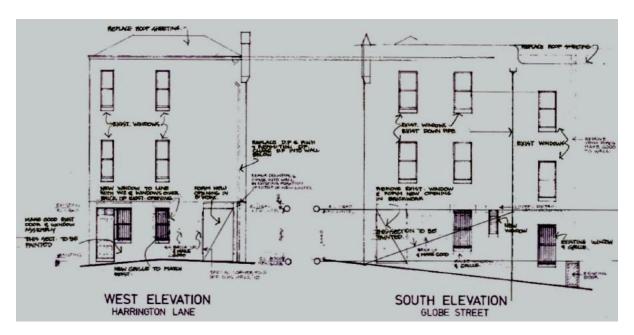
Alterations to the rear section of the ground floor of 143–143a George Street to create the shop tenancy shown in the plan above. Source: PMNSW ROX-410-AR-0033-OD, 1978.
